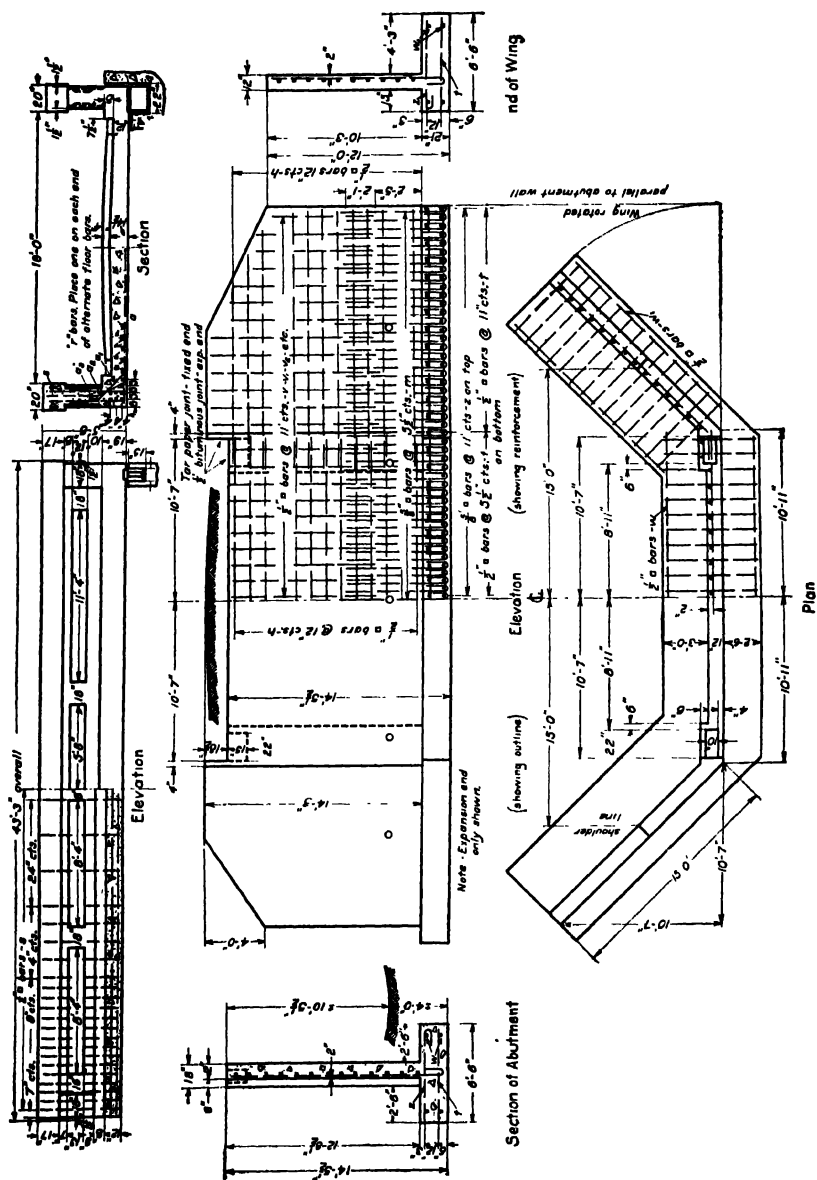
Typical design reinforced concrete through girder bridge—span 40 ft.—roadway 18 ft.—height 16 ft.
